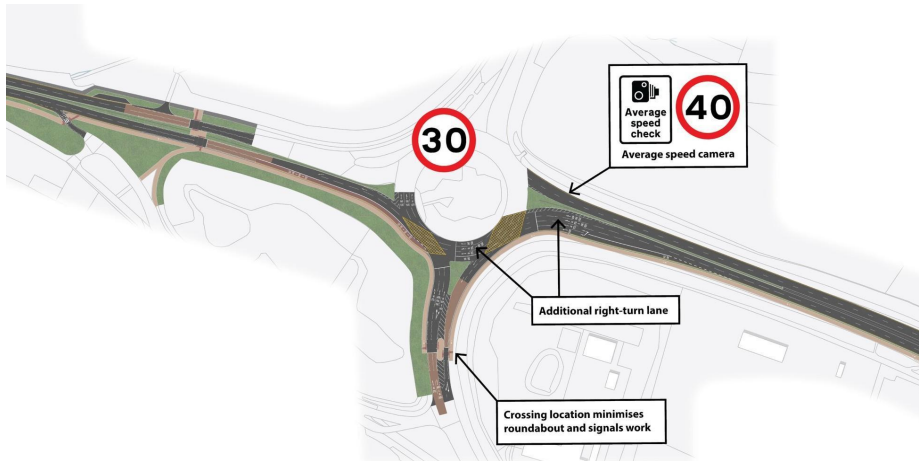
Hicks Gate proposals, including the new crossing south of the roundabout. Source: WECA consultation drawing reproduced in the Bristol Cycling Campaign draft.
